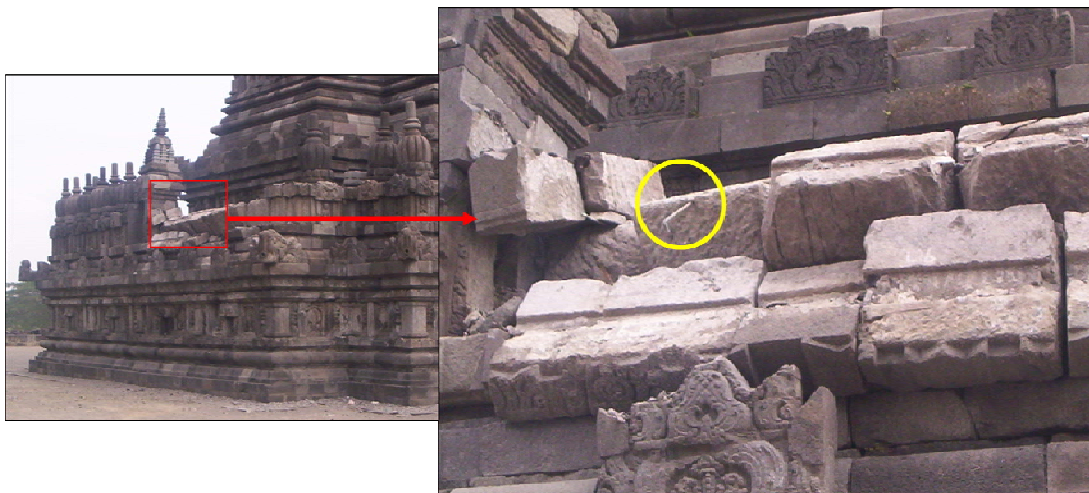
Damage to Prambanan and previous retrofitting with steel dowels
